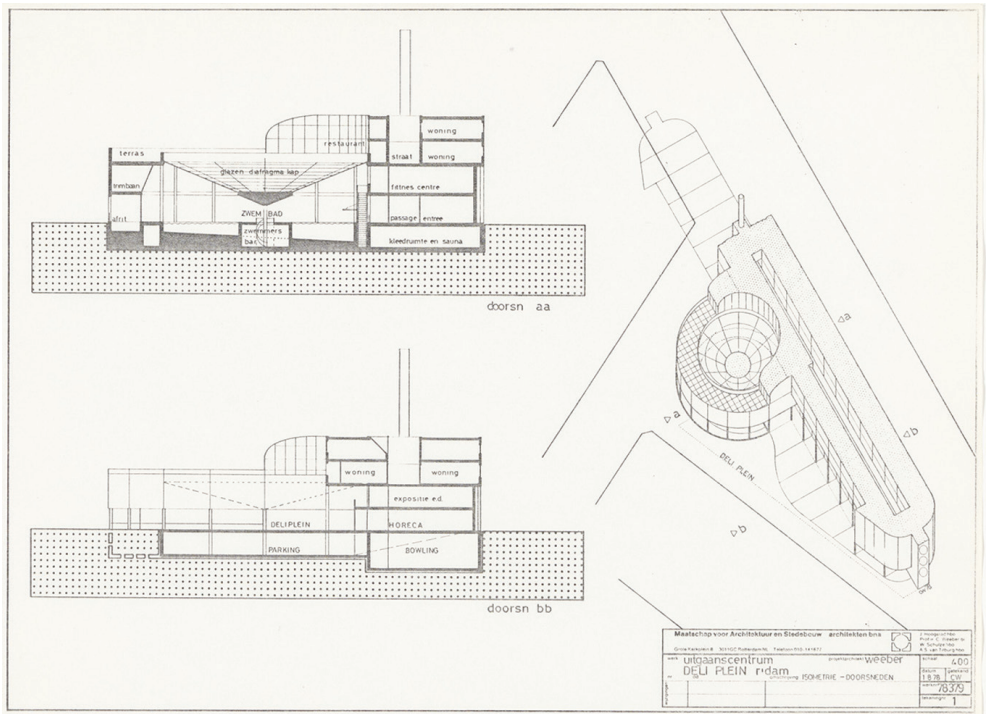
Design plan of (unrealized) entertainment centre on Katendrecht's Deliplein, showing cross-sections of the building's intended facilities, by architect Carel Weeber (1978)
